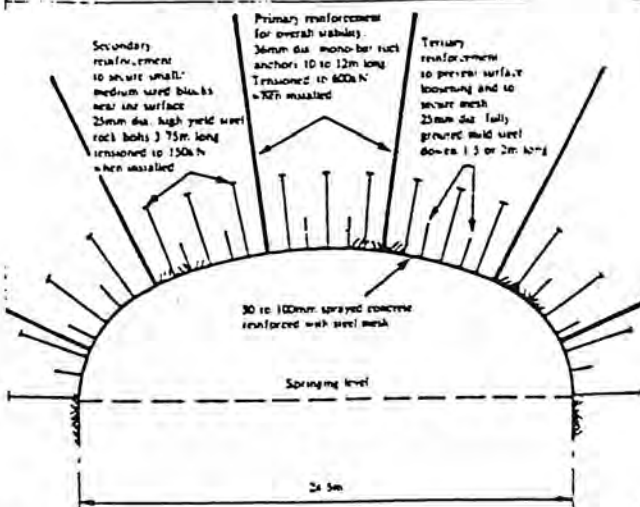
Primary, secondary and tertiary reinforcement (after Douglas et al, 1979).
